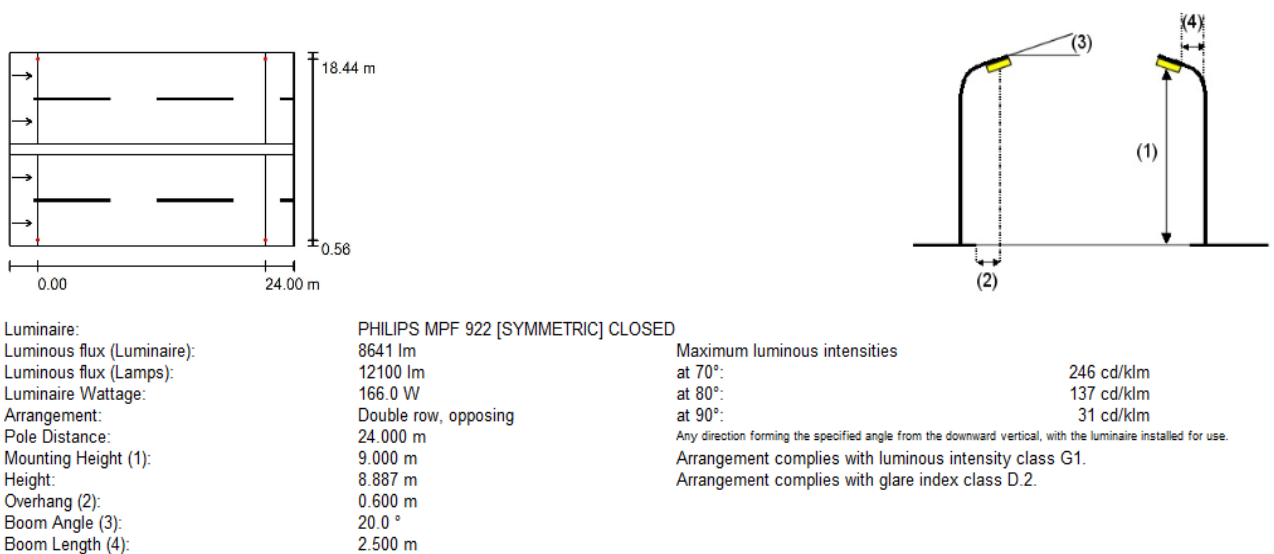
Street & Luminaire Planning Details of Plan-IV
